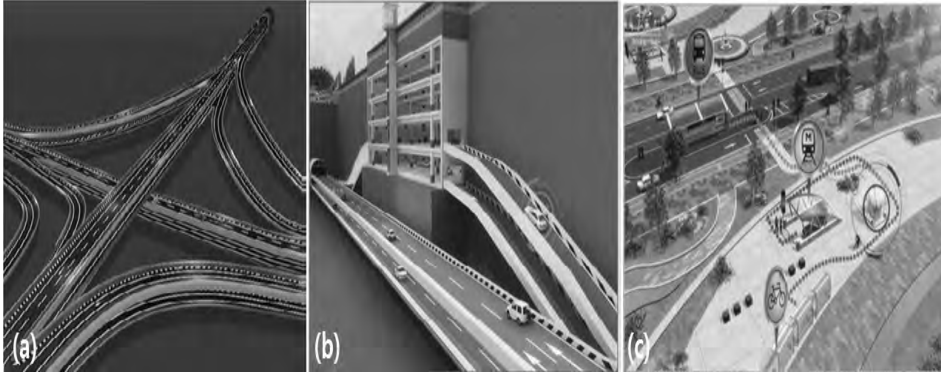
Connecting System with the Road above the Ground of U-SMARTWAY (a) JCT, (b) Underground Parking rot, (c) Connection with Transportation above the Ground
